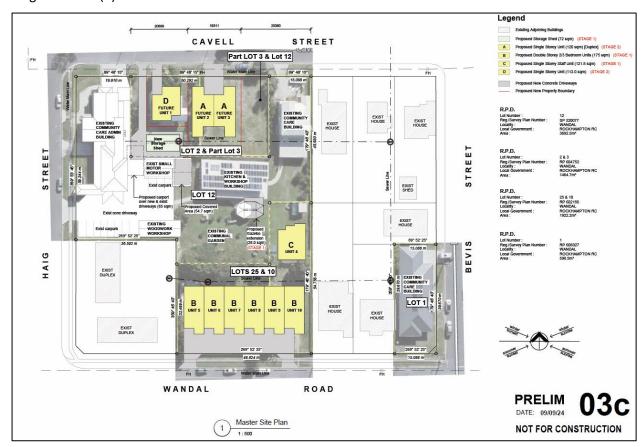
Proposed staging Plan (Rufus Design Group Plan; ref: 230704-01)
